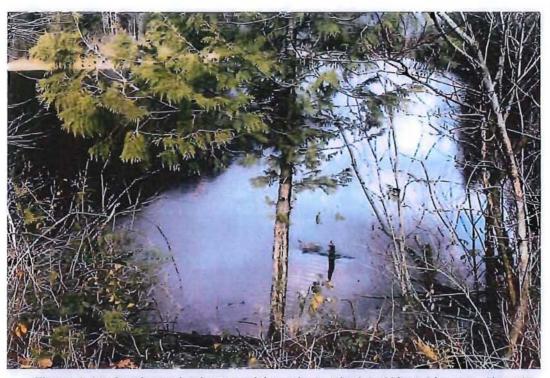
Surcharged culvert servicing private District of Kent driveway. Site 05D
